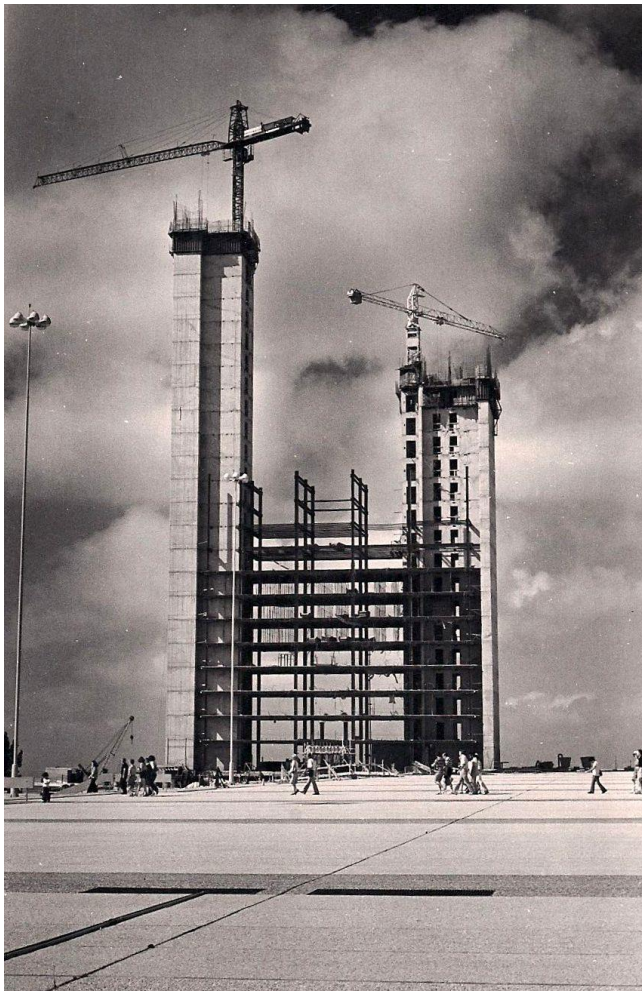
Eshkol Tower during construction, ca. 1975, a photograph showing the construction of the steel structural frame between the two service cores made out of reinforced concrete (University of Haifa Archive)
